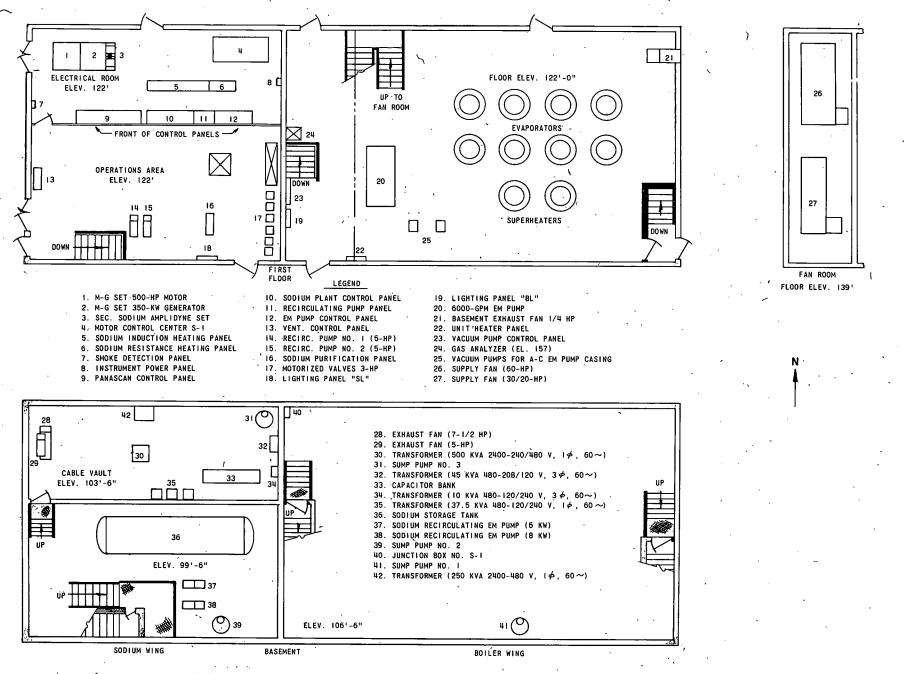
Arrangement of Equipment in Sodium-Boiler Plant
